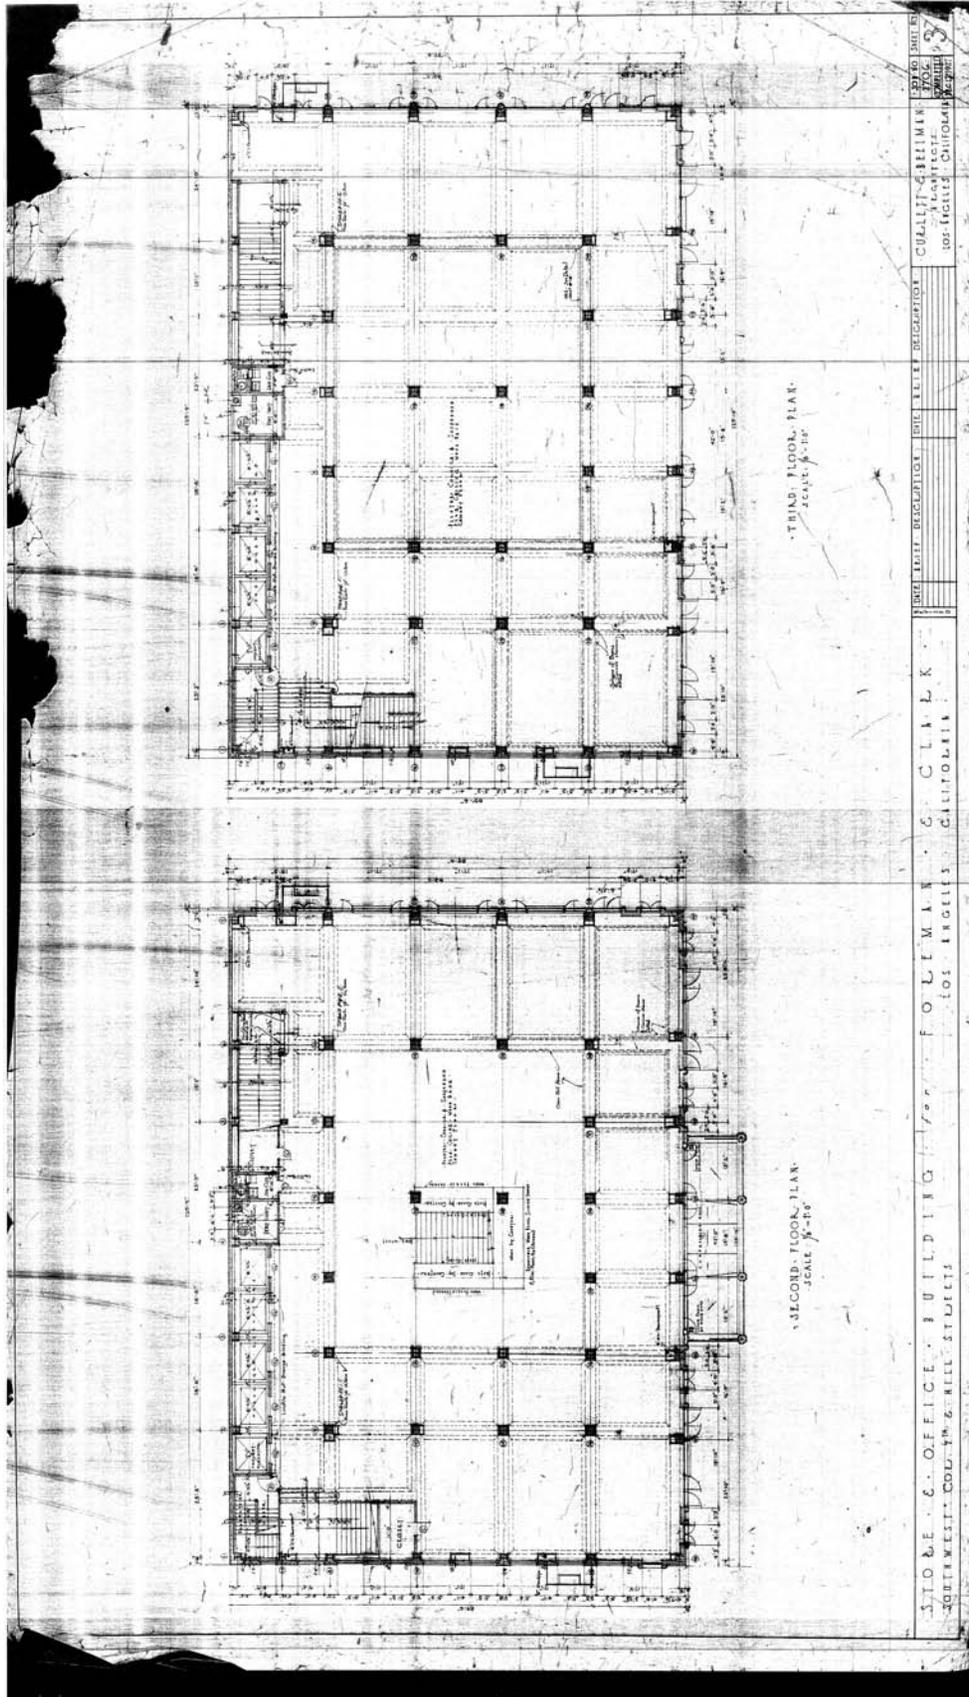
Construction plans for the 2nd and 3rd floors of the Foreman & Clark building. (Curllett and Beelman Architects.)
